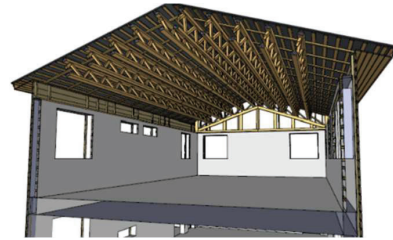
Pitched roof can be constructed effectively using joists by fixing the joist parallel to the ridge.
